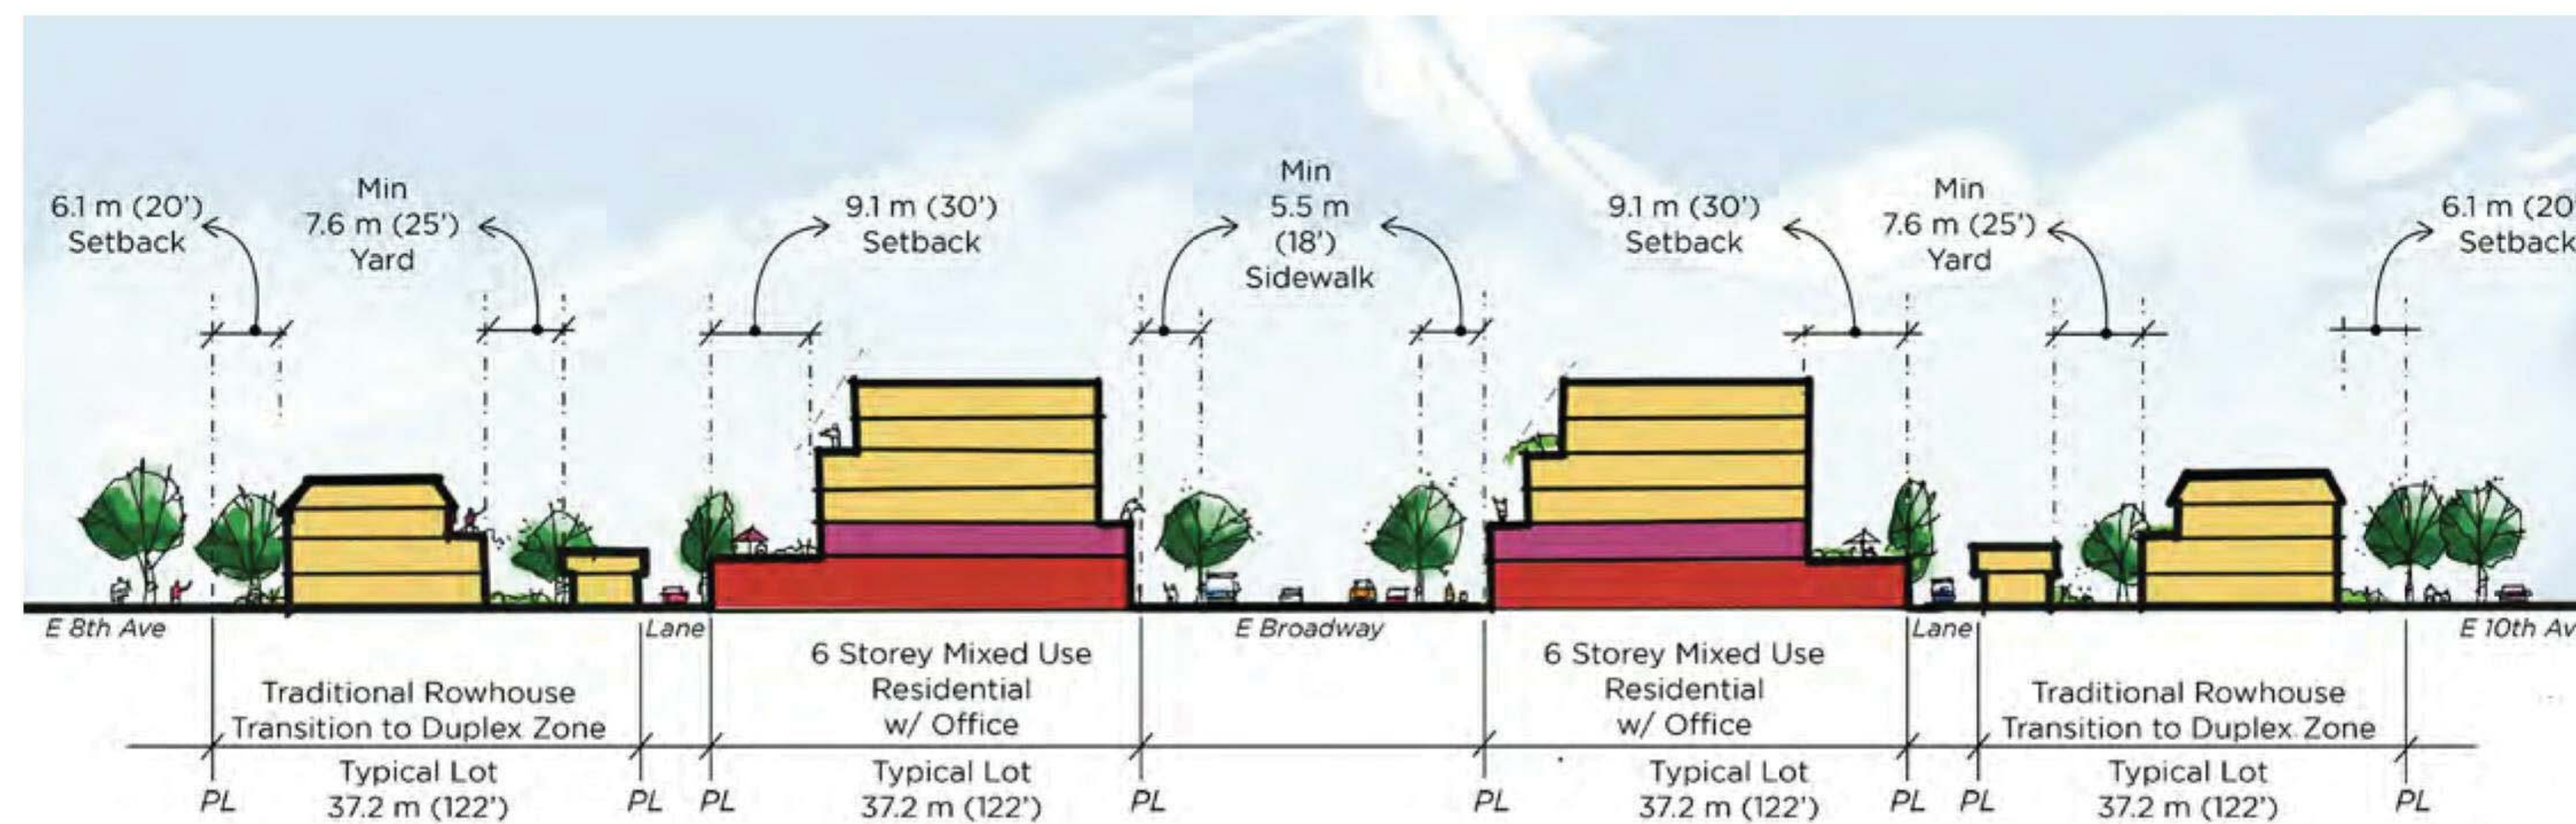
Grandview Cut to Semlin Drive Typical Section from Grandview-Woodland Community Plan - Section 6.71
